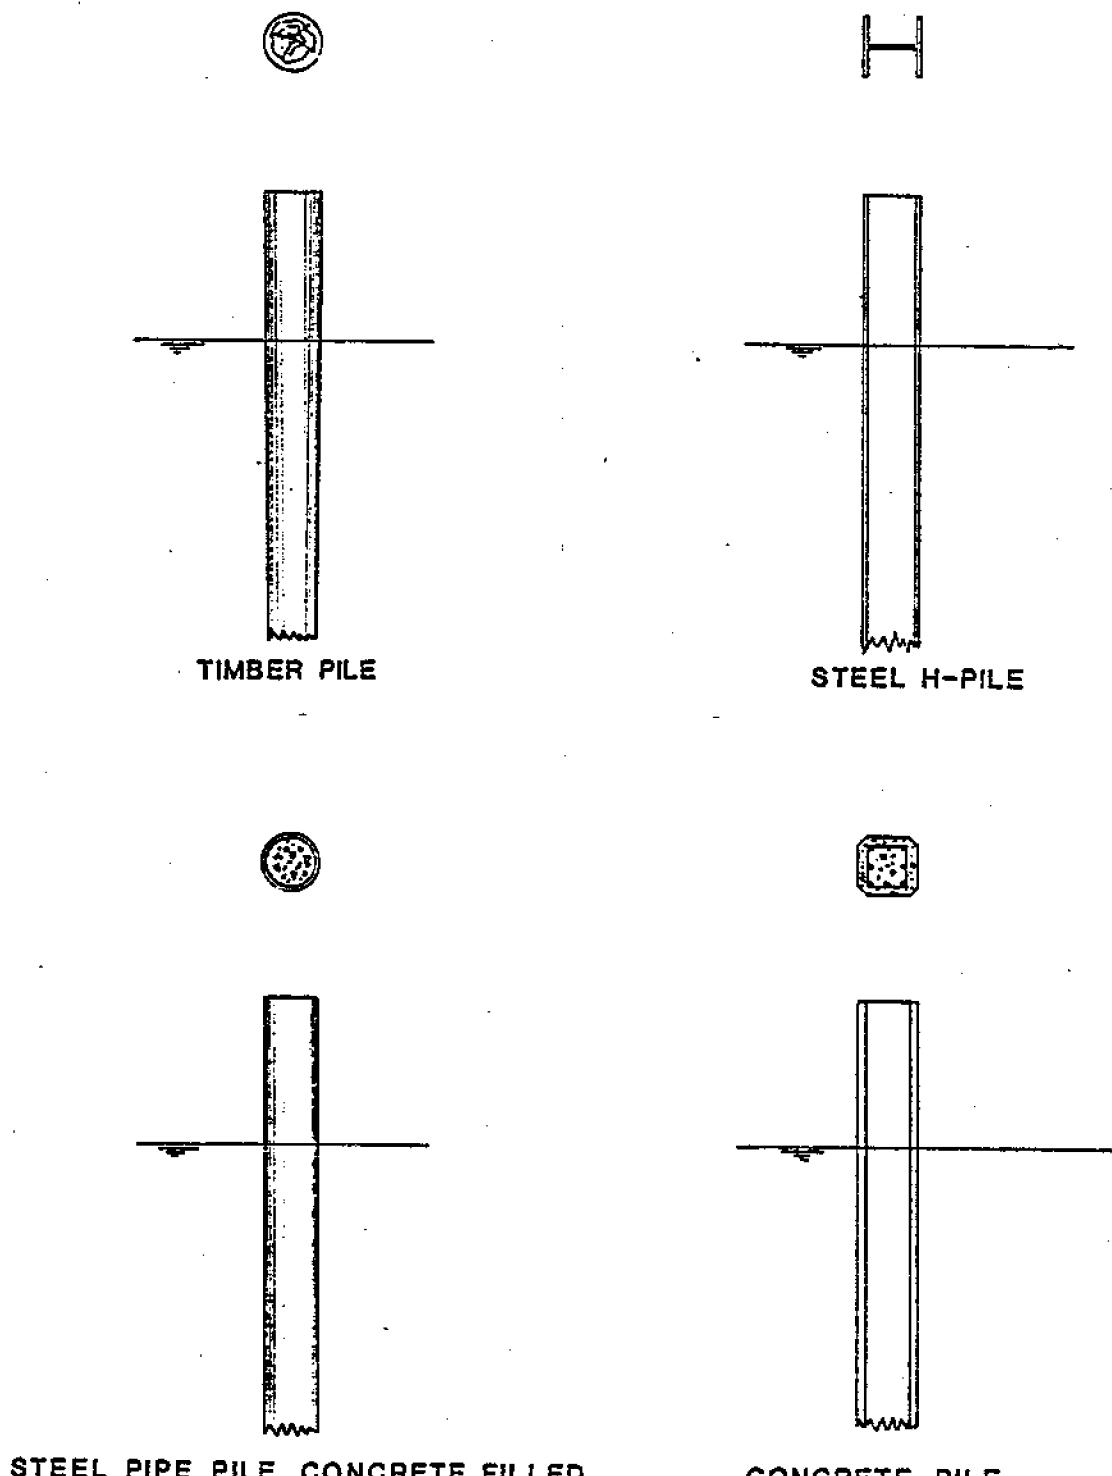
Typical Pile Types Used in Waterfront Construction
